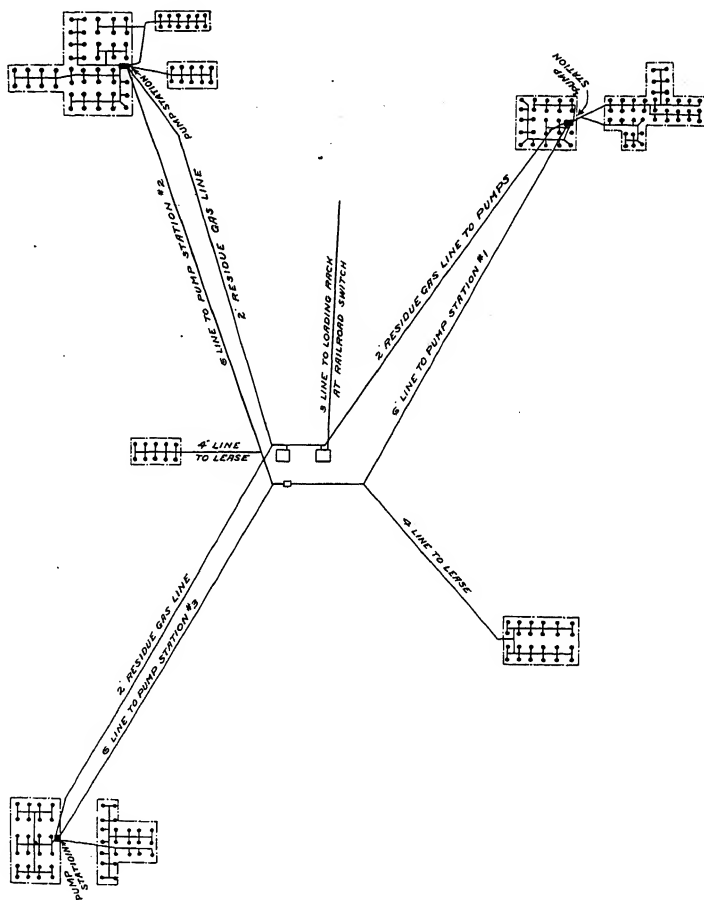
GENERAL PLAN OF A GASOLINE PLANT
